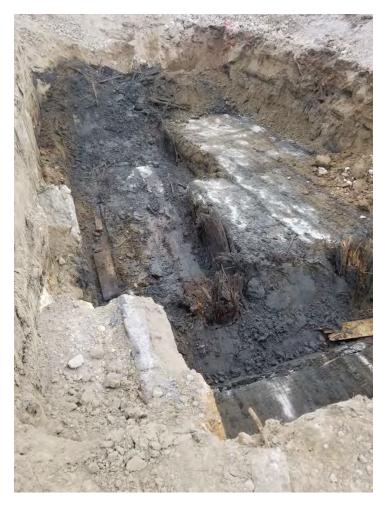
Western extension of BBH Area excavation, view looking west from main excavation area.
